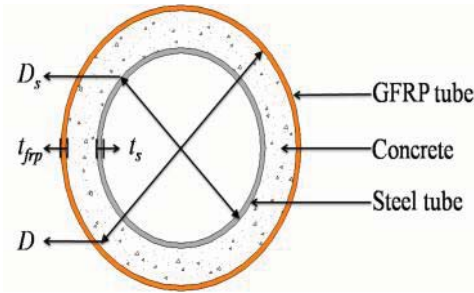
Cross-section of hybrid FRP-concrete-steel double-skin tubular column.
